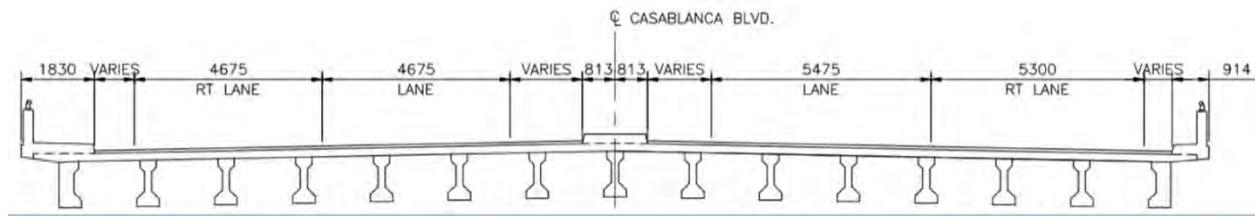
Cross Section of Existing-Casablanca Boulevard Across QEW Structure (looking north)
